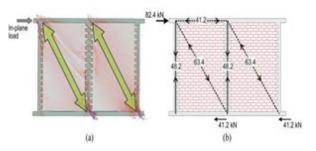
Strut and Tie in Masonry Infilled Walls
